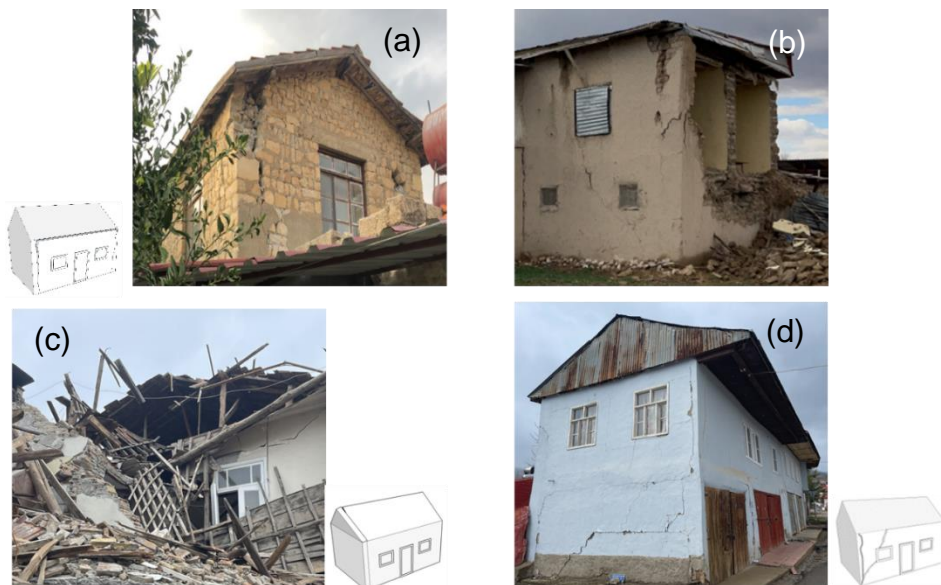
(a) OOP failure due to the absence of connections between external bearing walls; (b) OOP failure due to the lack of connections between external and internal walls; (c) Gable collapse resulting from OOP failures; (d) OOP failure due to the absence of connections on one side of the load-bearing walls. Sketches adapted from Novelli et al. (2021).
